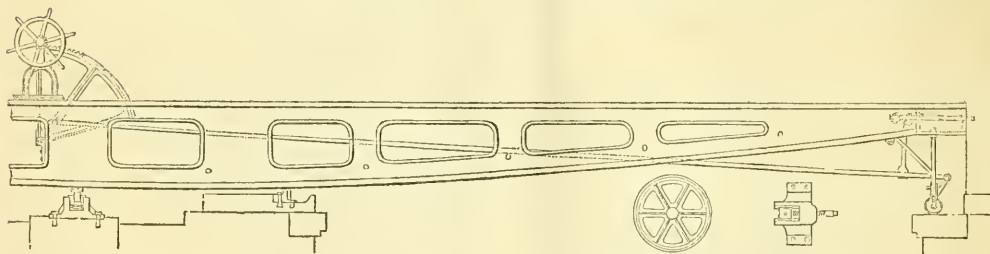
Elevation of half of the swing bridge, showing its machinery.
